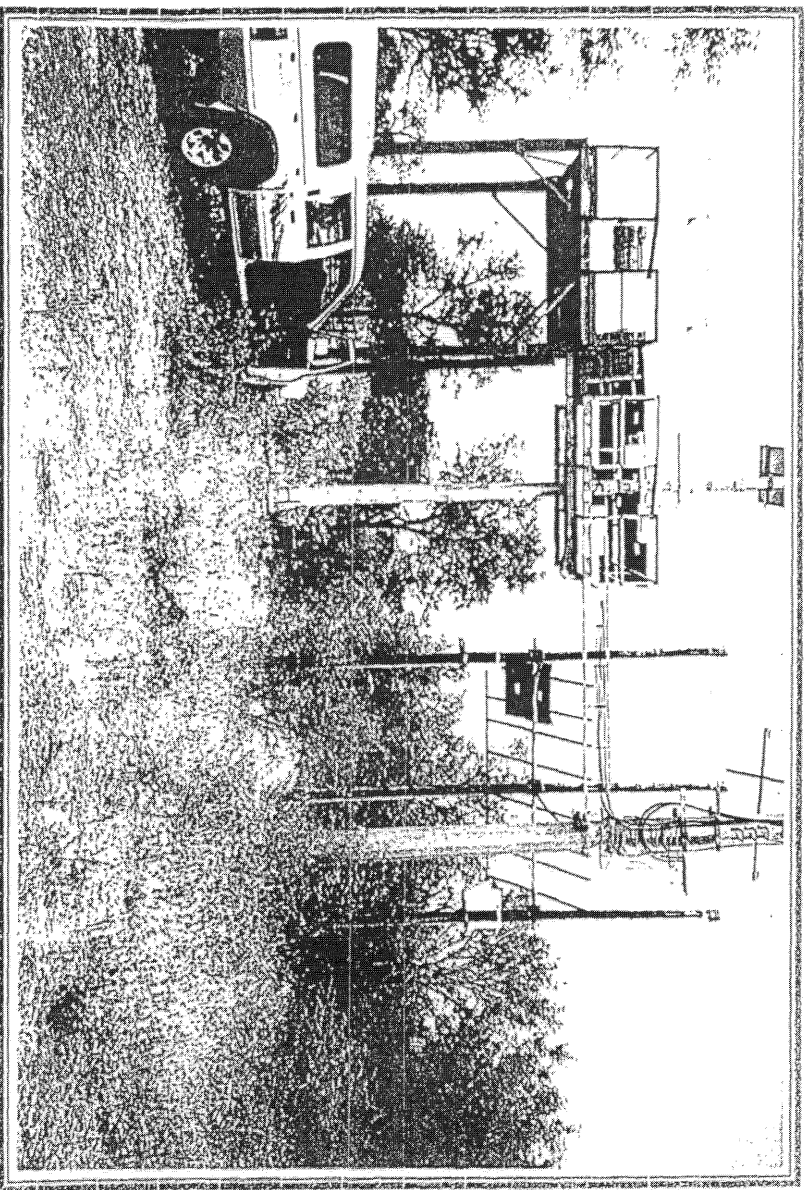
Site 3 (24 Riviero). Existing Telkom mast.
